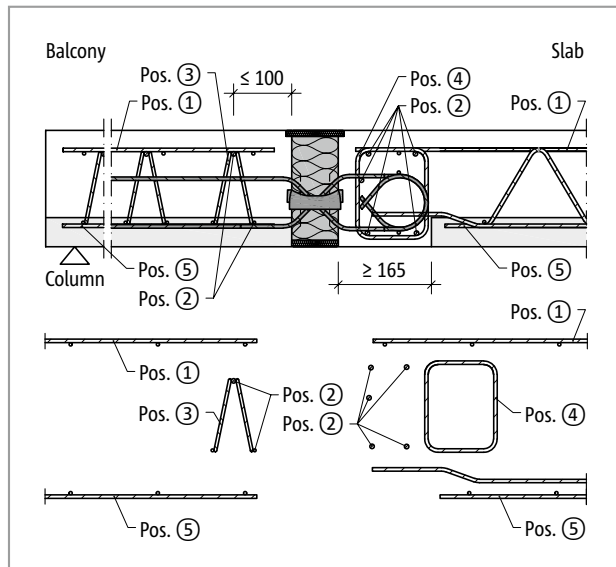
Schöck Isokorb® T type Q-VV1 to Q-VV5: On-site reinforcement with lattice beam
